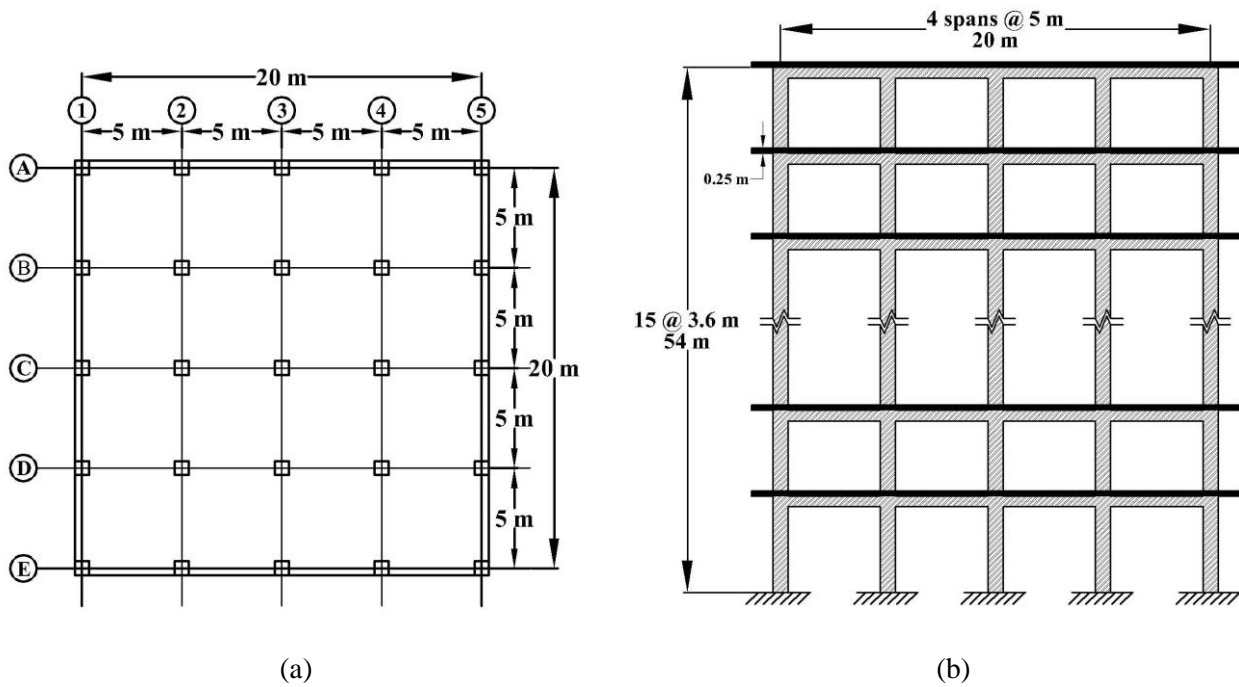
(a) Plan (b) Elevation view of prototype structures
